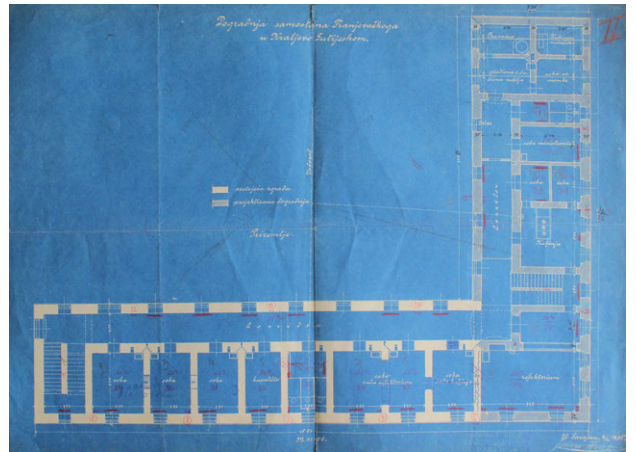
The Convent of Saint John the Baptist, Kraljeva Sutjeska: ground floor plan, segment of the project done by Johann Holz in 1895 (Stari planovi crkve, Archive Kraljeva Sutjeska)
